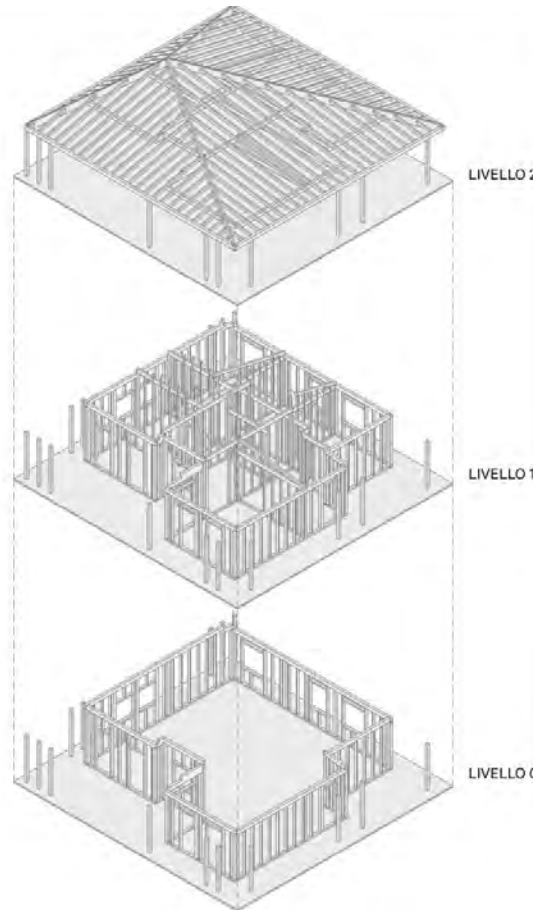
In the 8 House, the wooden fir lamellar wood frame is made of uprights and crosspieces with base beam 16x10 cm, upper beam 16x10 cm, uprights and crosspieces 16x6 cm.
